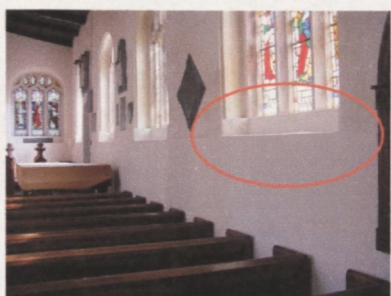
Abbotsbury. Carved stone details of the window cills flooded by later overskim plaster.
